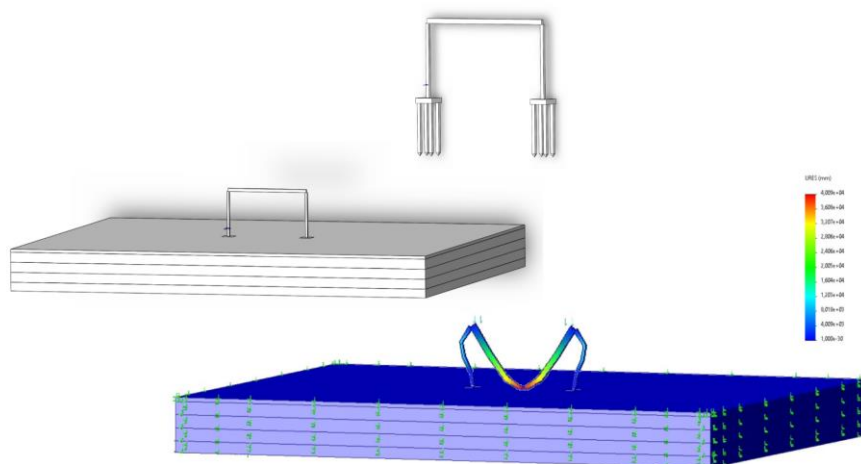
Geometry of the reinforced concrete element, joint geometry of soil types, deformation diagram construction under load
